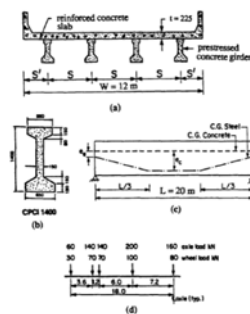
Example 2: (a) Bridge Cross Section; (b) Girder Cross Section; (c) Tendon Layout; (d) OHBDC Truck Load
